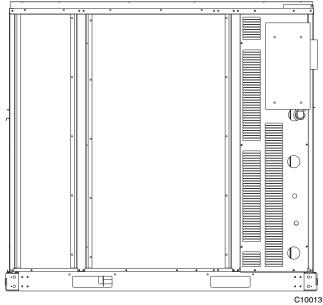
Mounting Position for Field Disconnects (up to 100A)
